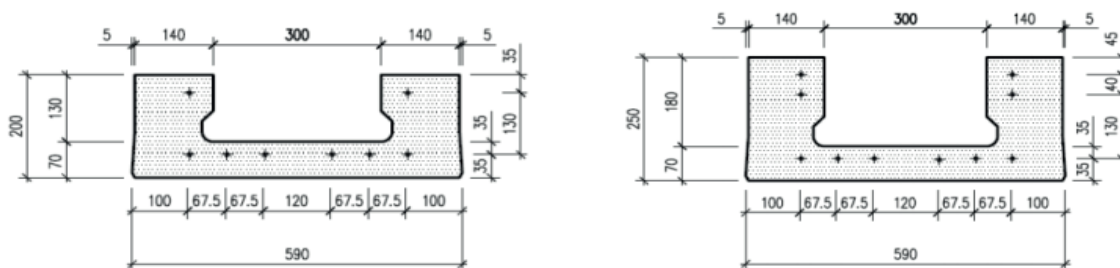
Prefabricated floor with cold water pipes on the lower plate
